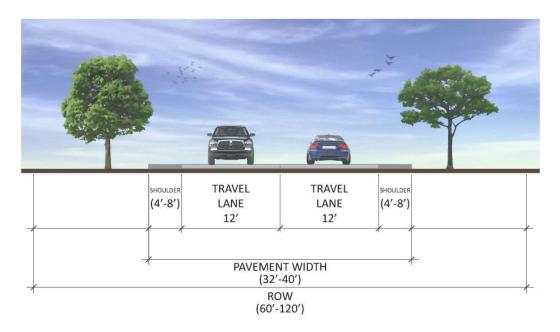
Proposed Rural Arterial Cross-Section
